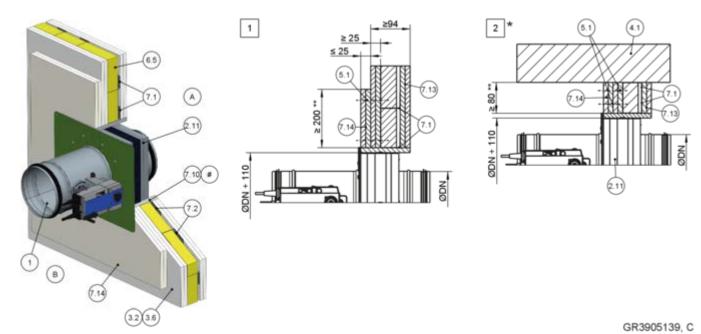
Dry mortarless installation in lightweight partition wall with installation kit TQ2 – Installation not flush with wall
